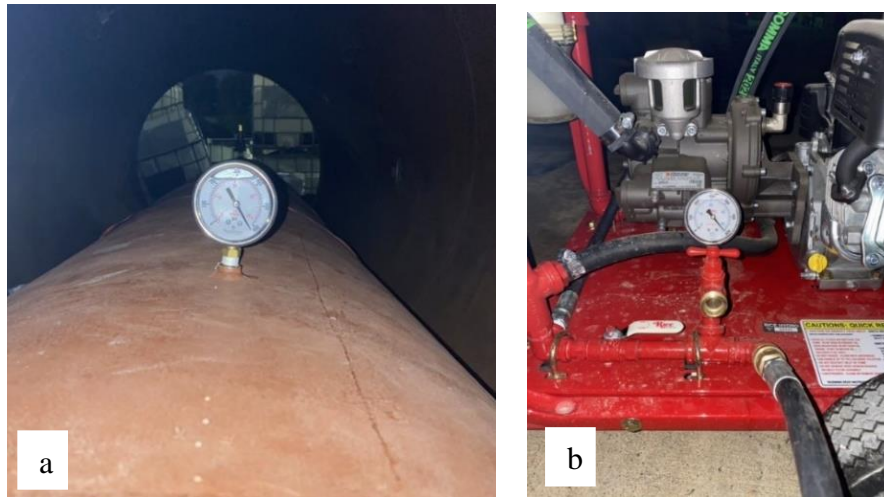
(a) Pressure Dial Gauge Reading on Test Setup (b) Pressure Dial Gauge Reading on Pump
